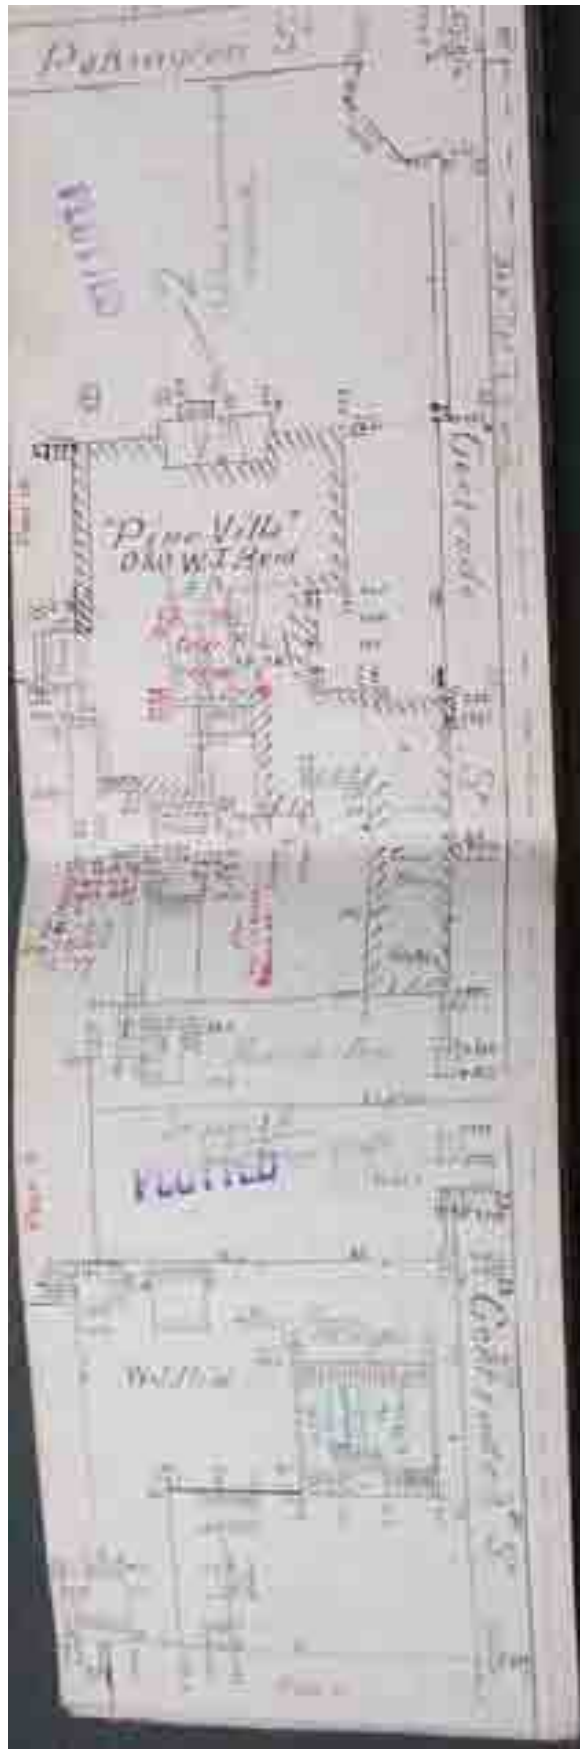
Sketch plan of "Pineville", showing rear coach house, stables & other outbuildings, 1912. Source: Geelong Waterworks & Sewerage Trust Fieldbook plan, no. 163, p.13, 10 October 1912, Barwon Water collection.
